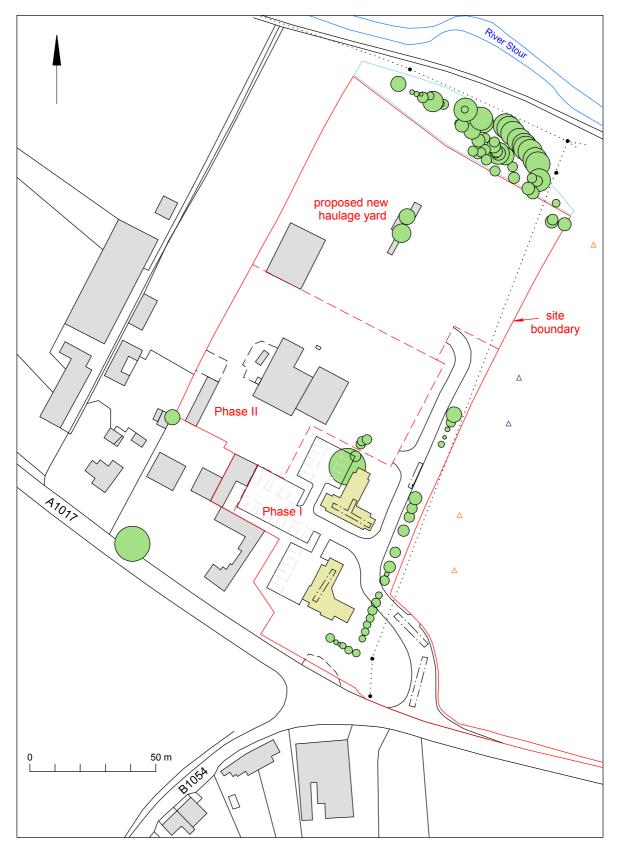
Site plan showing the proposed Phase 1 development (yellow).
